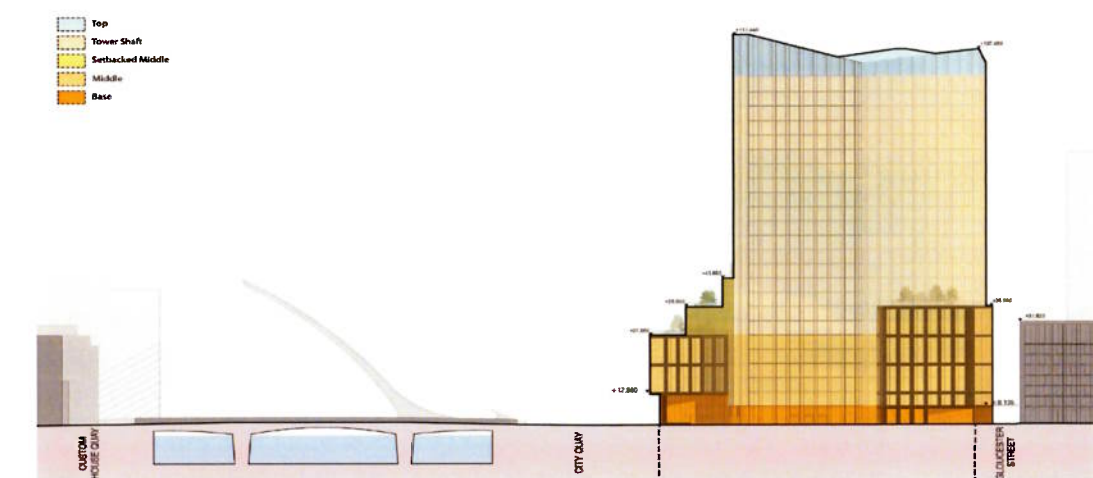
Elevation of Proposed Building's Tower Shaft from Gardiner Street
